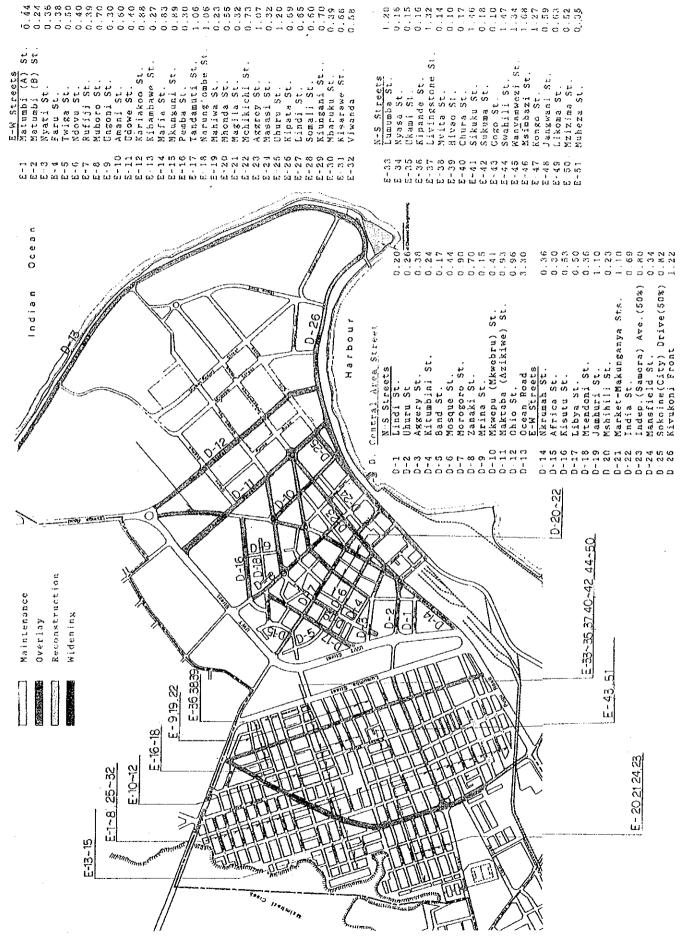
Detailed Improvement Measures of Central and Kariakoo Area Roads 12-23
